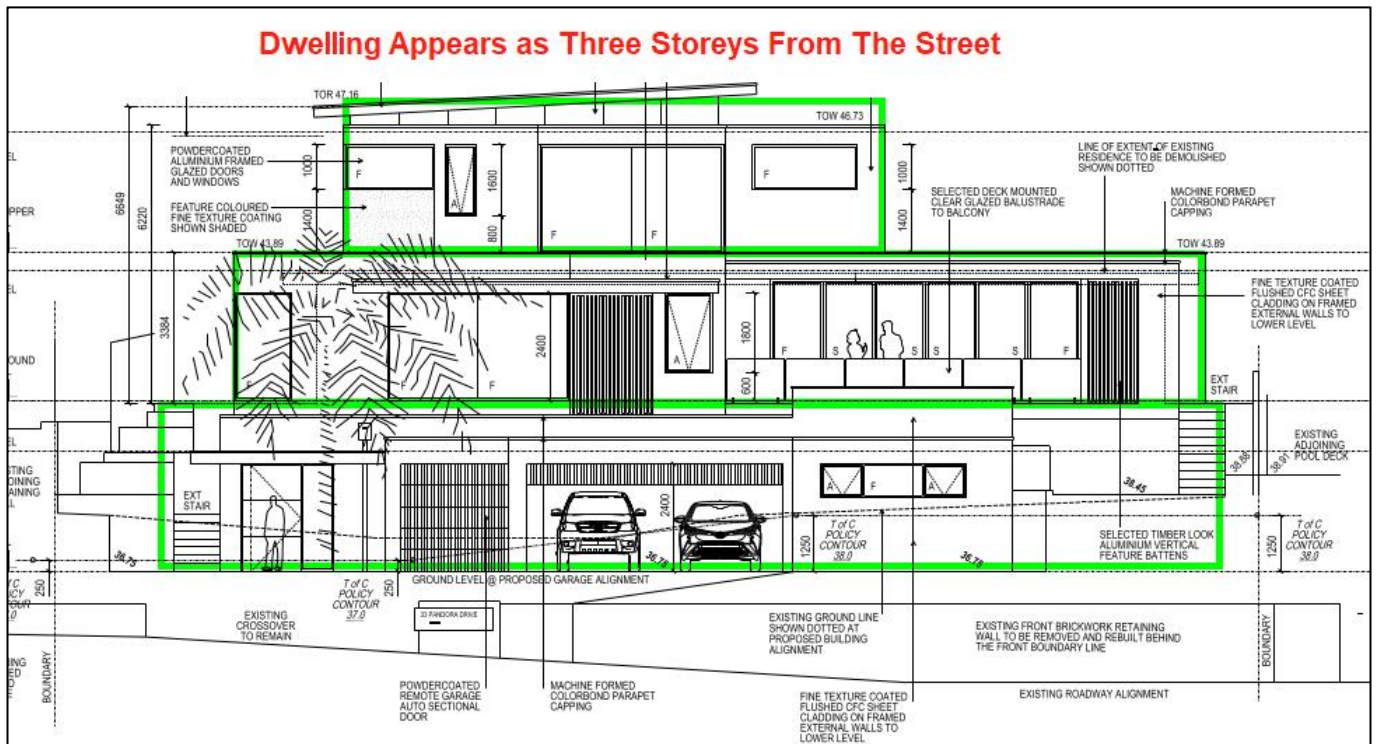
Marked-up street elevation showing that the dwelling appears to be three storeys as viewed from the street.
